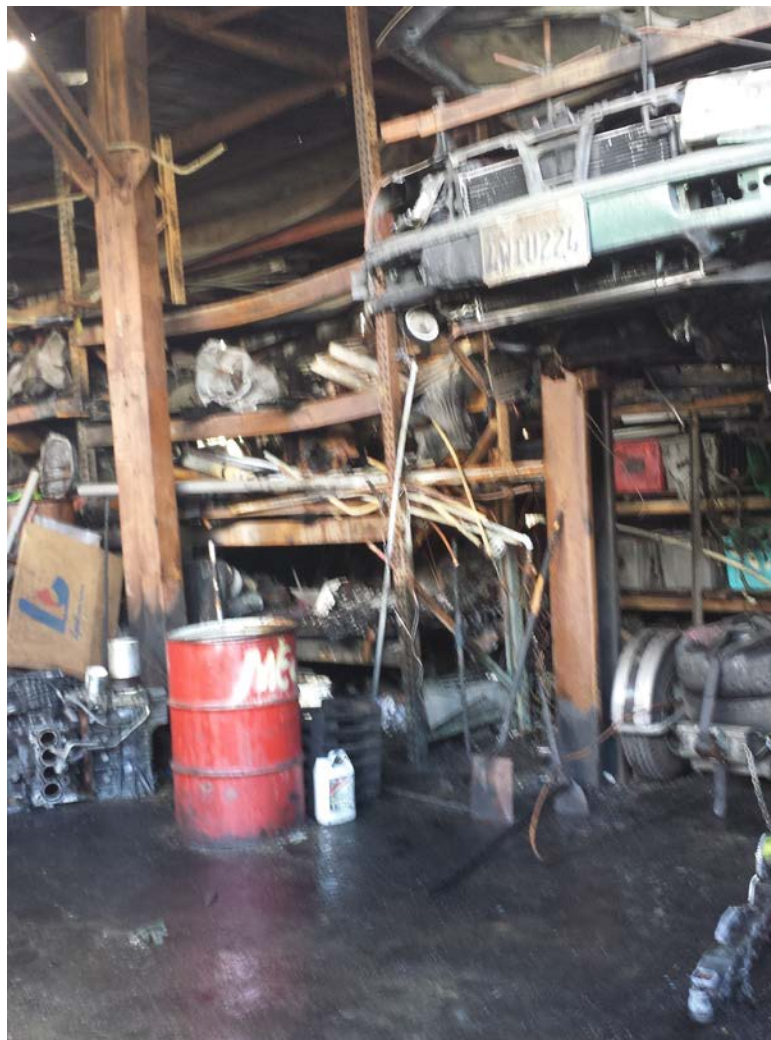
Photo taken on 12-4-14 showing interior of Manny's General Auto Repair shop. Note apparent fire damage.
